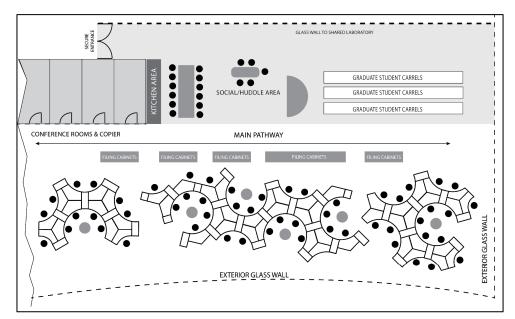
Cross-section of the Research Commons Floor Plan (not to scale)
